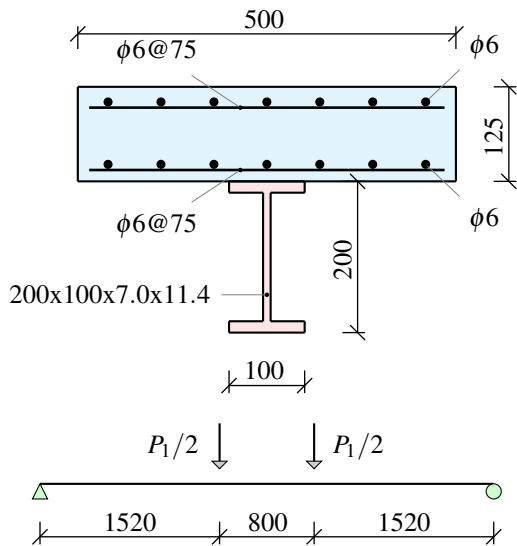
Cross-section and loading - specimen SCB-1 (Nie and Cai 2003).
